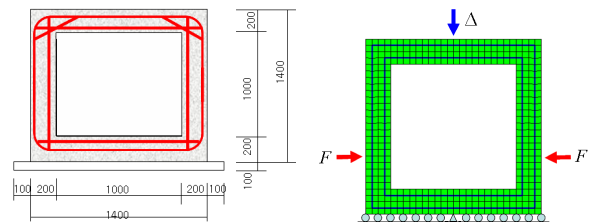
Configuration of Box Culvert (Kwon et al., 2008)
